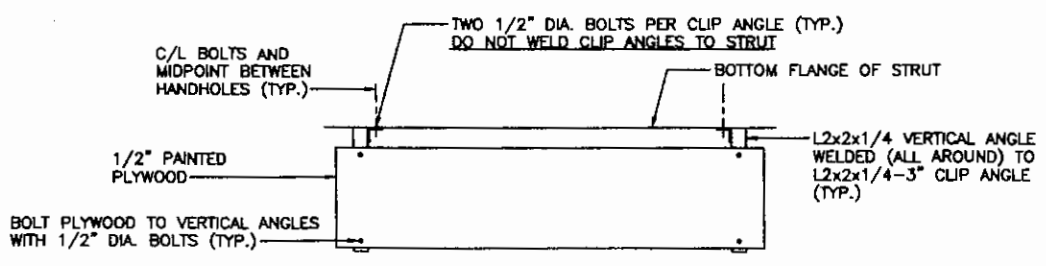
DETAIL OF NEW MOUNTING FRAME FOR NEW PANELBOARD
